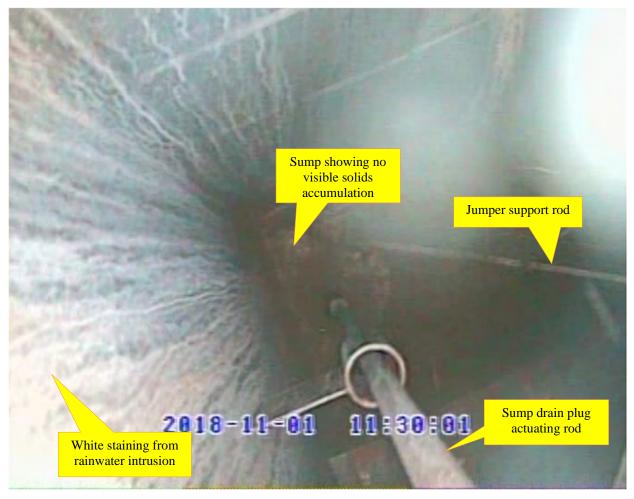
View Looking Down at the FDB-5 Sump (November 2018)
